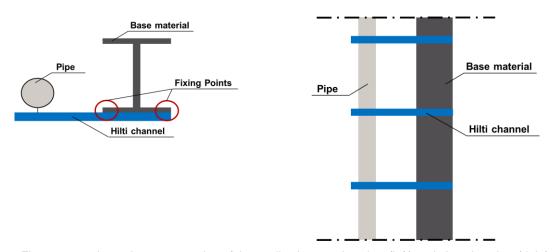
schematic representation of the application: section view (left) and elevation view (right).
